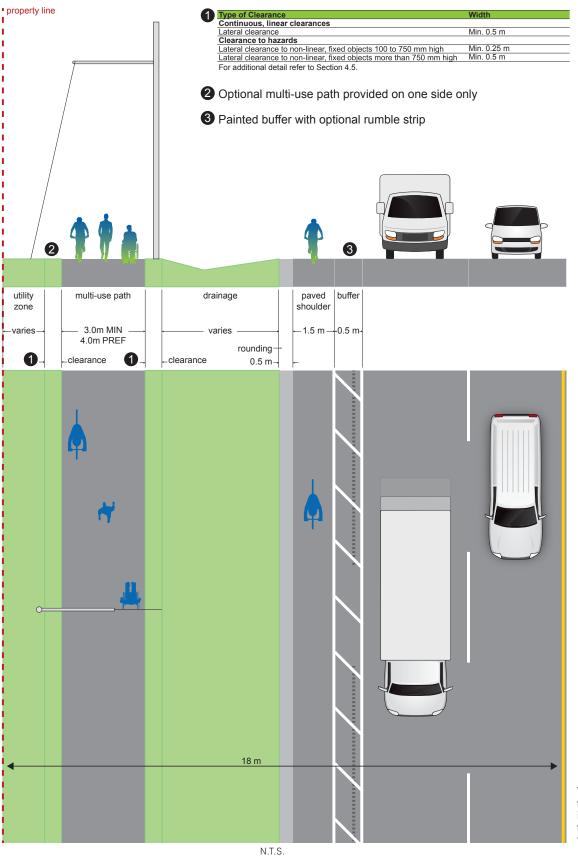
Rural Road (36 m ROW) – Paved shoulders with two travel lanes
